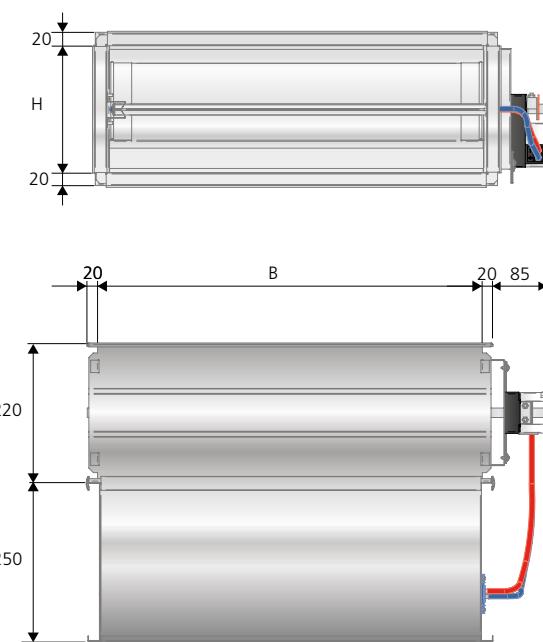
Dimensions (mm), REACT V rectangular, REACT V rectangular with spring return.
